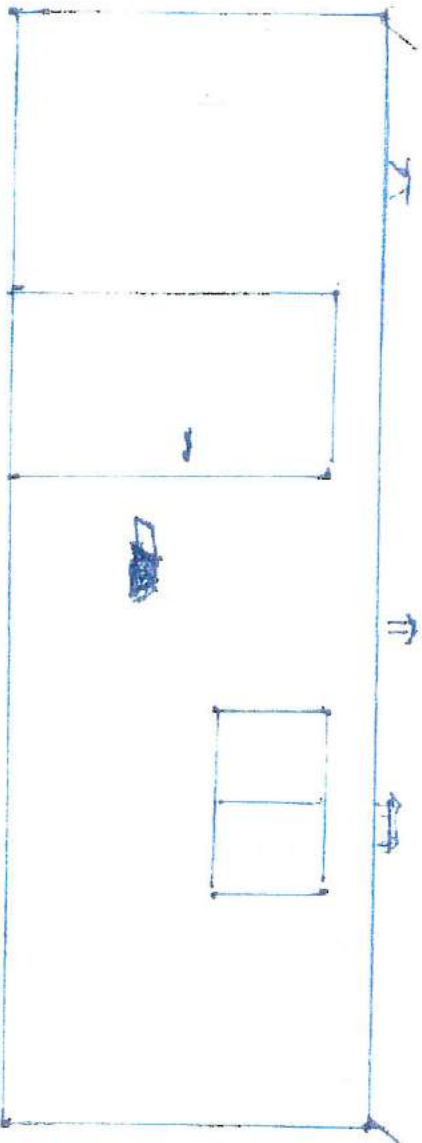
APPLICATION, SITE PLAN, ELEVATION
